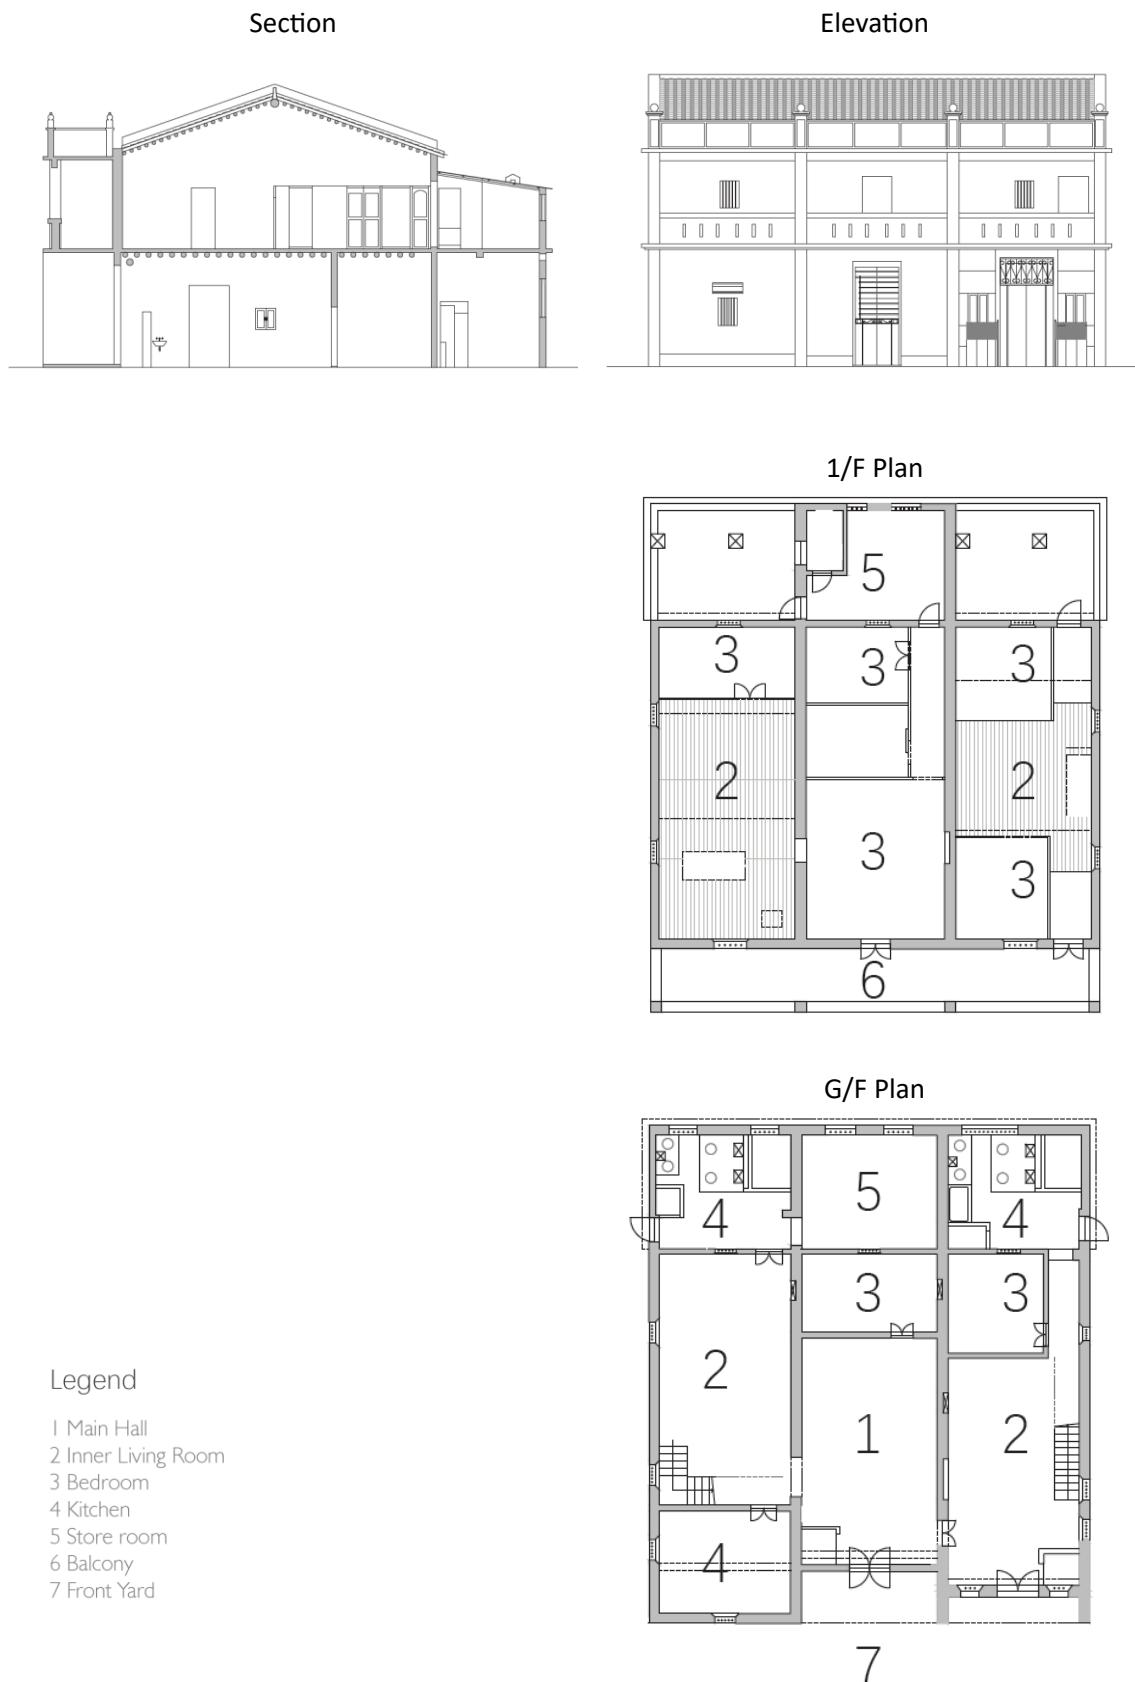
Plan, section and elevation of Yeung's Mansion
